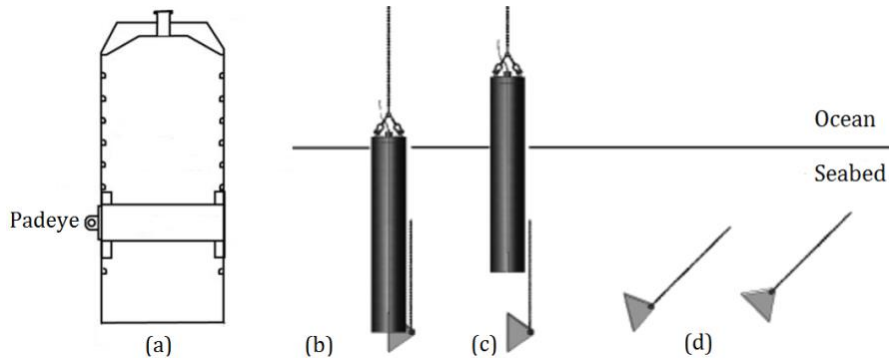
(a) Suction caisson anchor and installation of SEPLA's: (b) installation of suction caisson, (c) suction caisson retrieval, (d) plate anchor keying [39]
